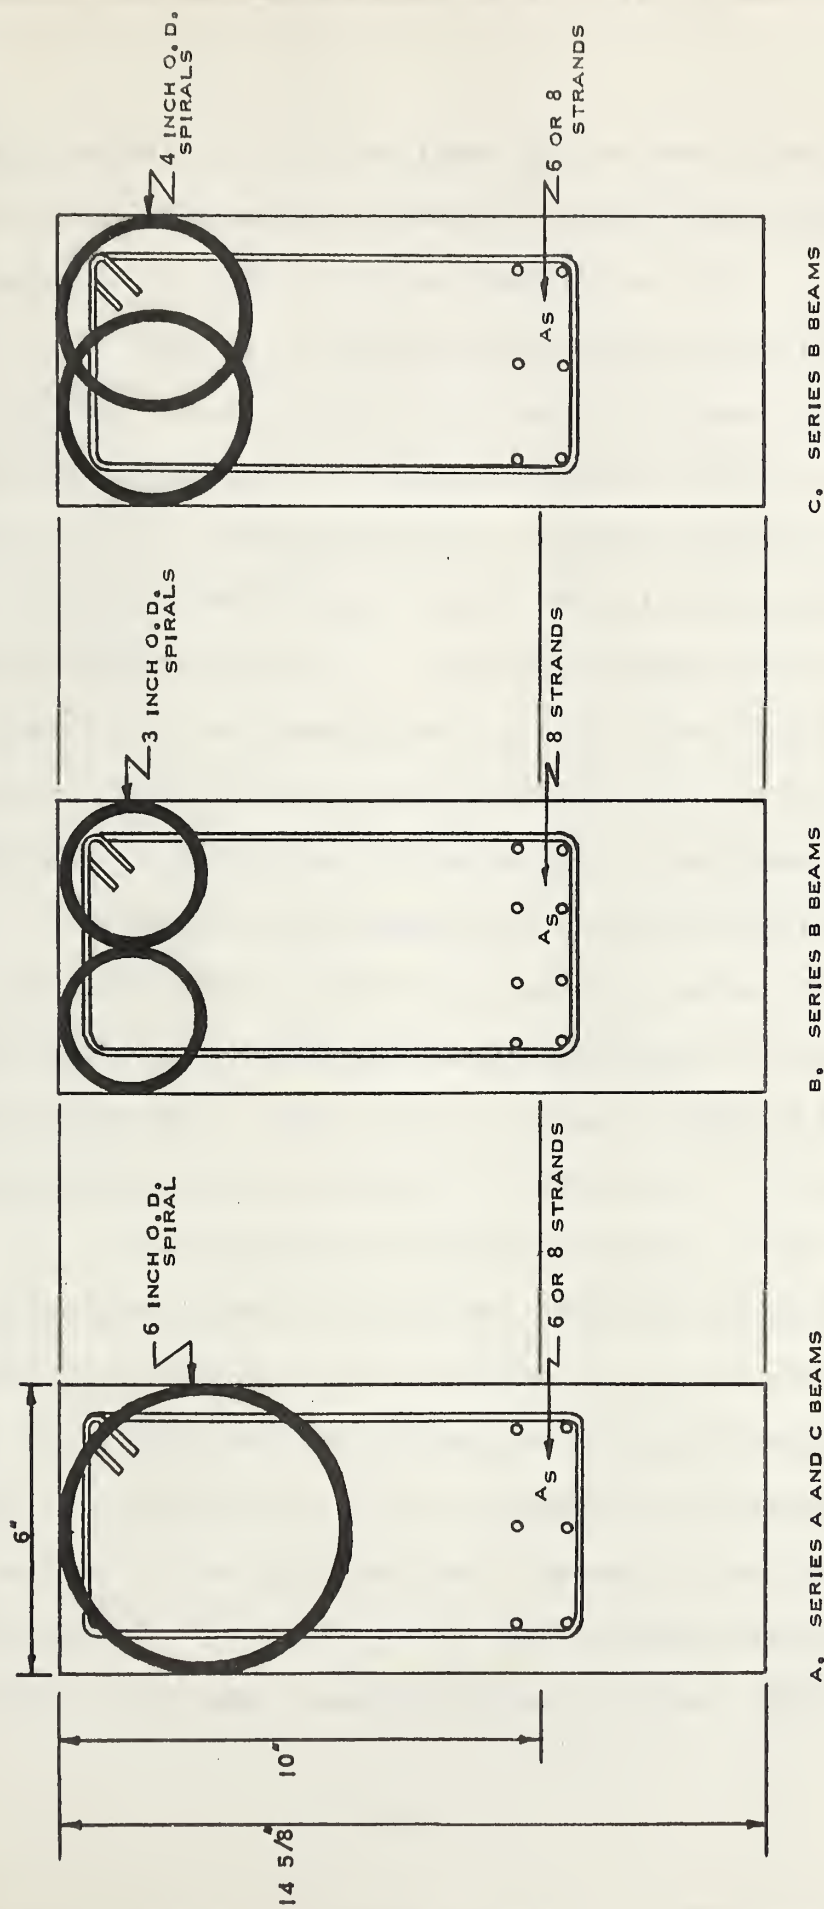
TEST SPECIMEN CROSS-SECTIONS
